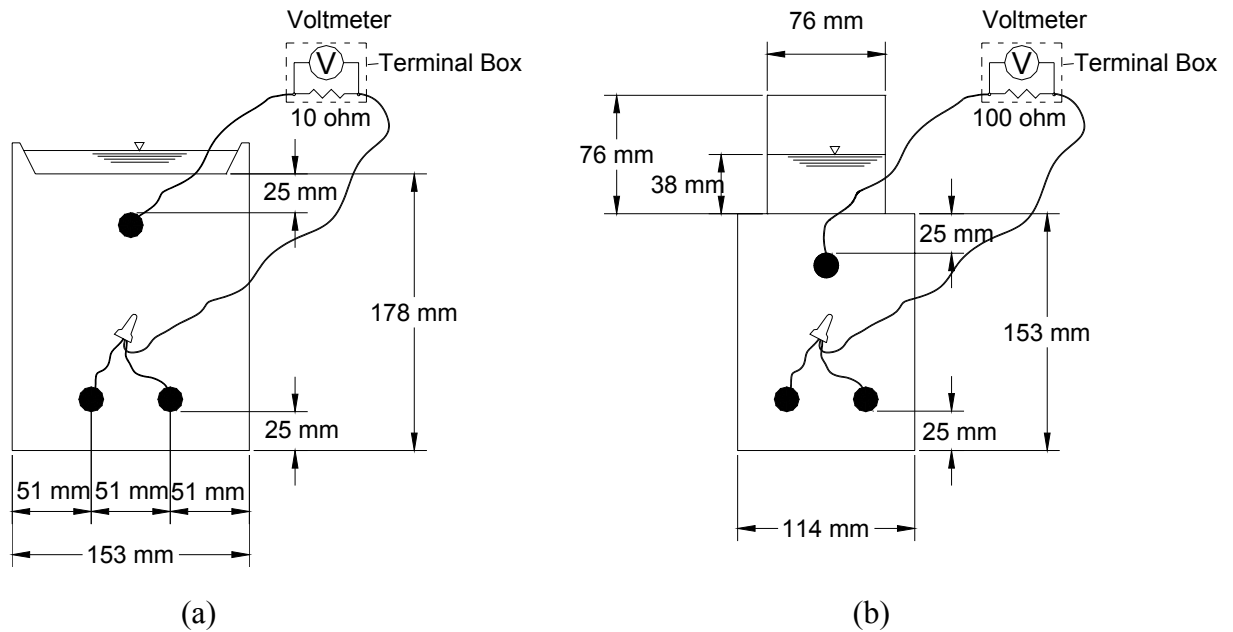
(a) Cracked Beam specimen and (b) G 109 specimen
